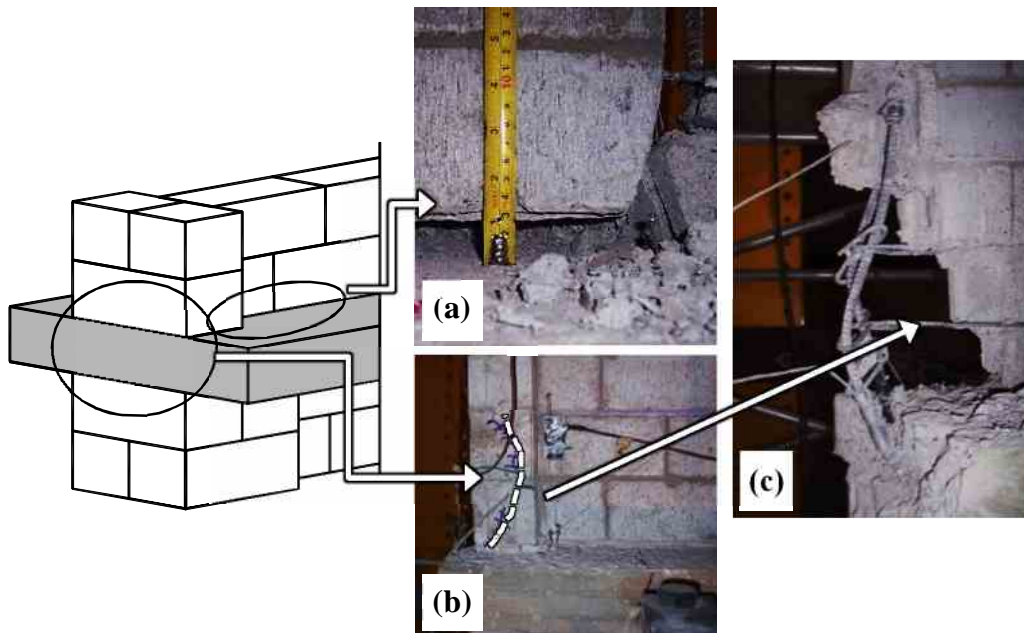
Post-Failure of Wall 10: a) Rocking of above 1st Floor Slab, b) Vertical Cracking in Flange, c) Exposed Vertical Reinforcement Due to Buckling
